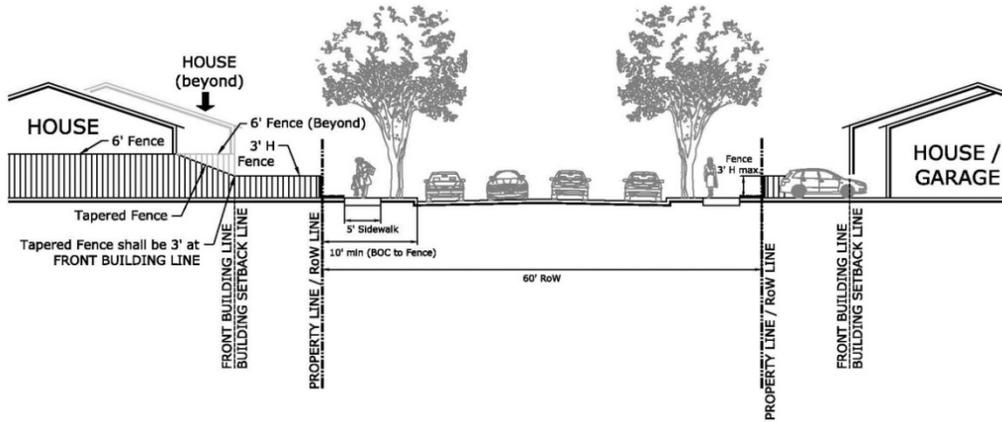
(c) – Typical Cross Section with Landscaped Area and Sidewalk
